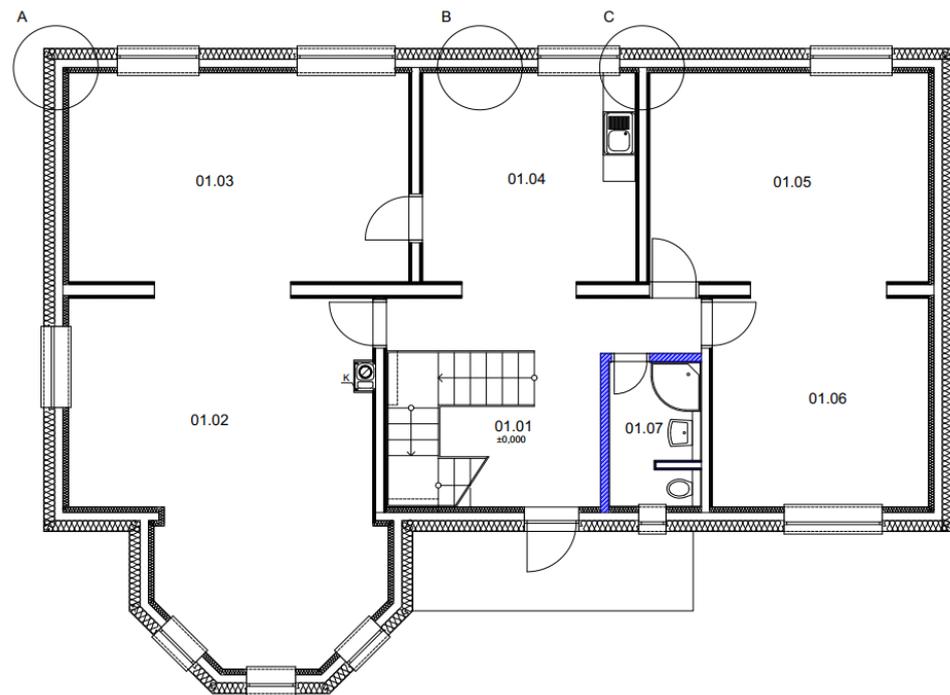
First floor plan showing the location of details A, B, and C; K—chimney for fireplace; the digit +0.000 indicates the ground floor elevation.
